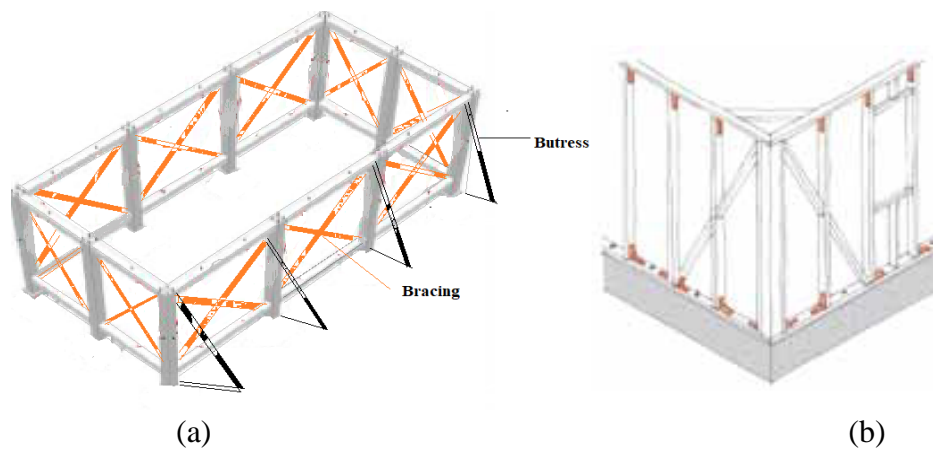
Schematic wall structure of the implemented house. (a) bracing and buttress with wall structure (b) Hurricane cape
